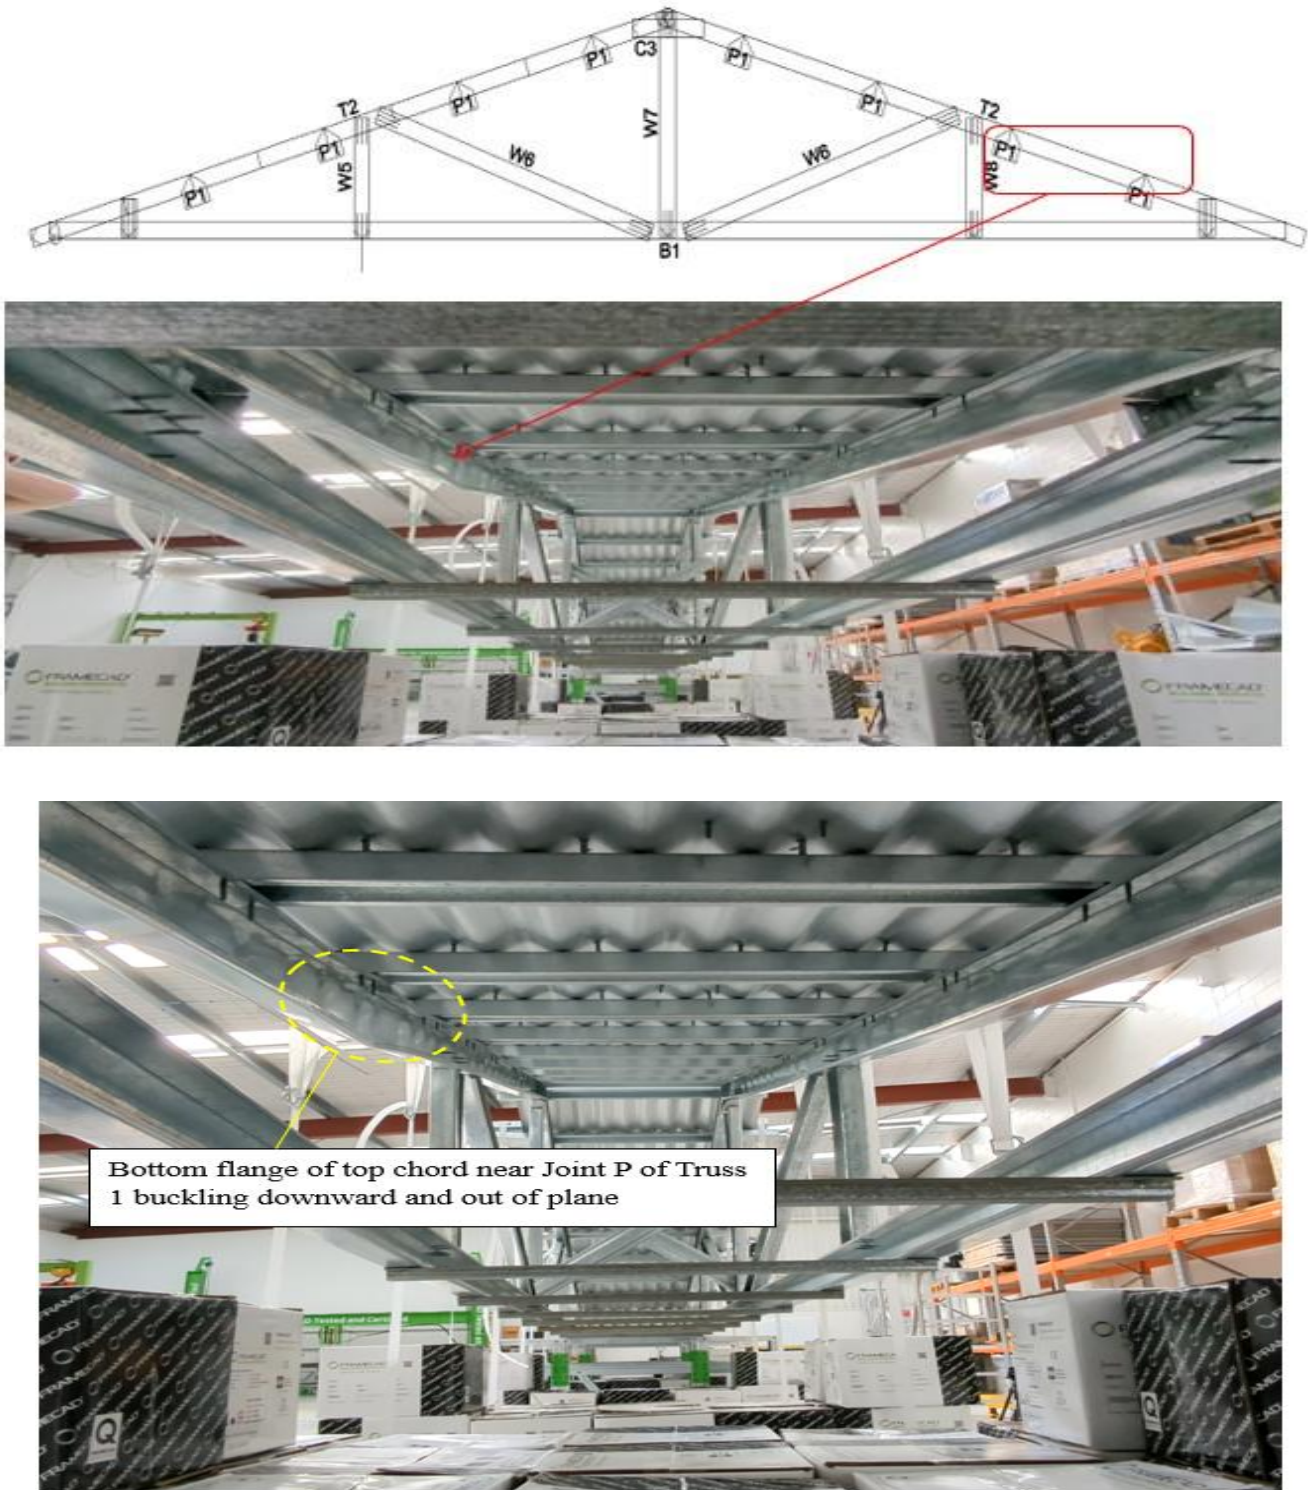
Distortional buckling failure on Truss 1 of Test 7
